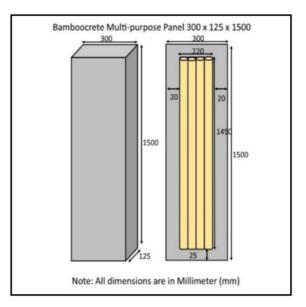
Bamboo reinforcement in PKS lightweight concrete
